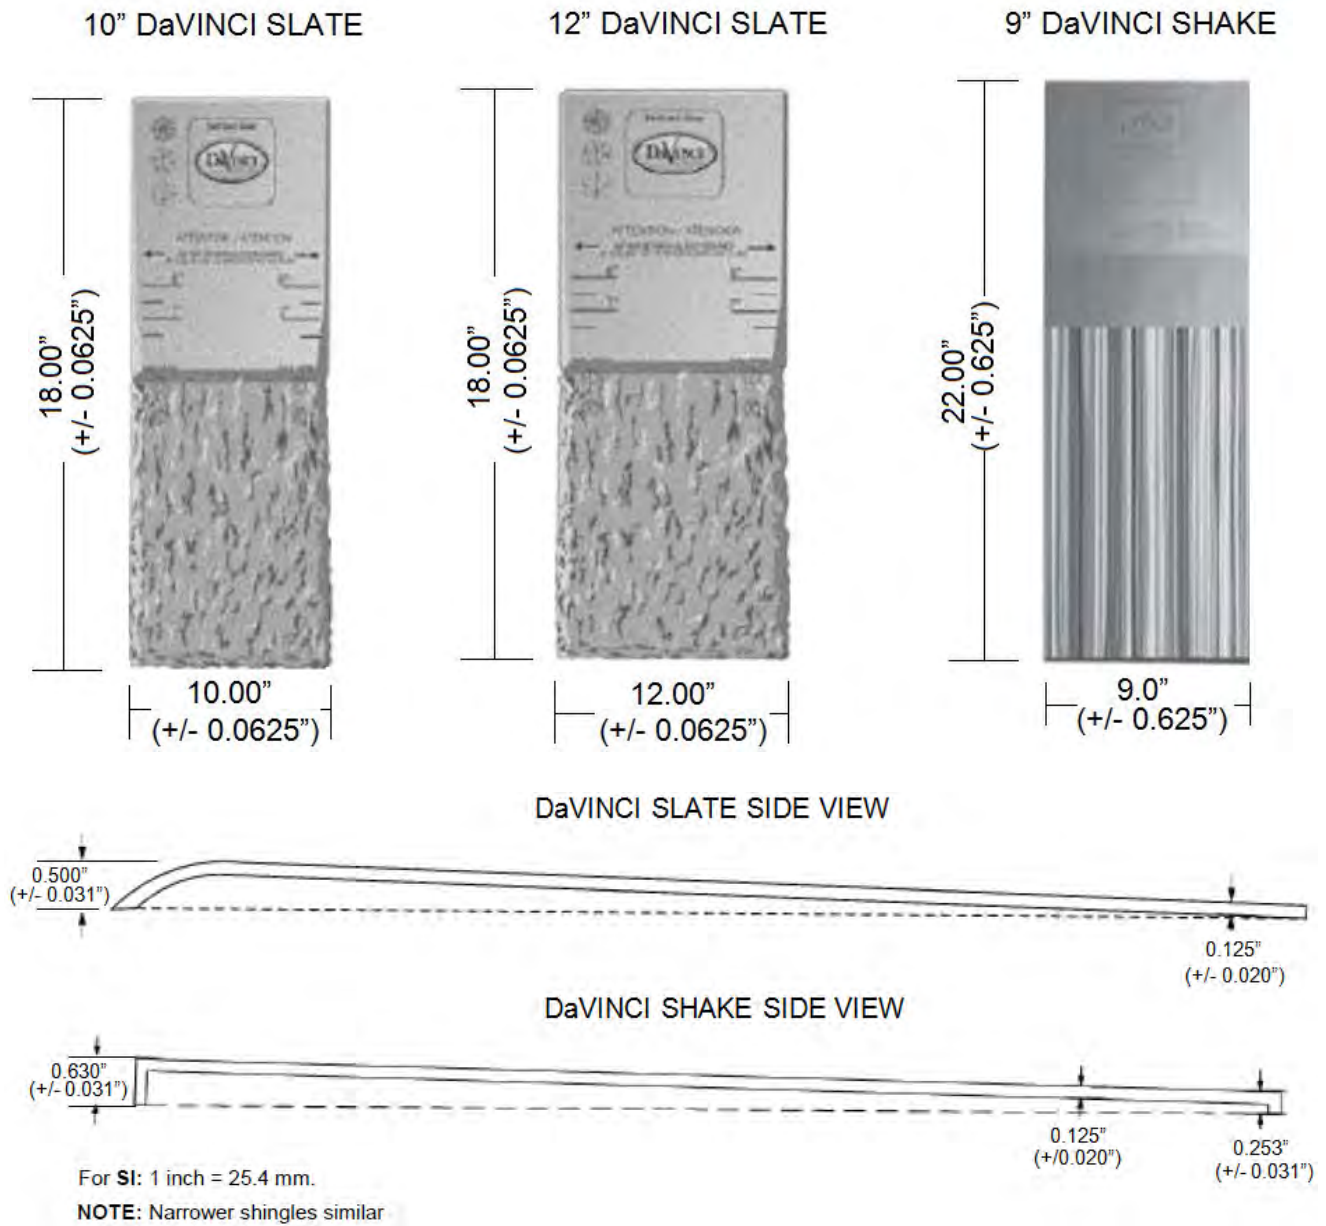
DaVINCI SLATE ROOF SHINGLES AND SHAKE ROOF SHINGLES
